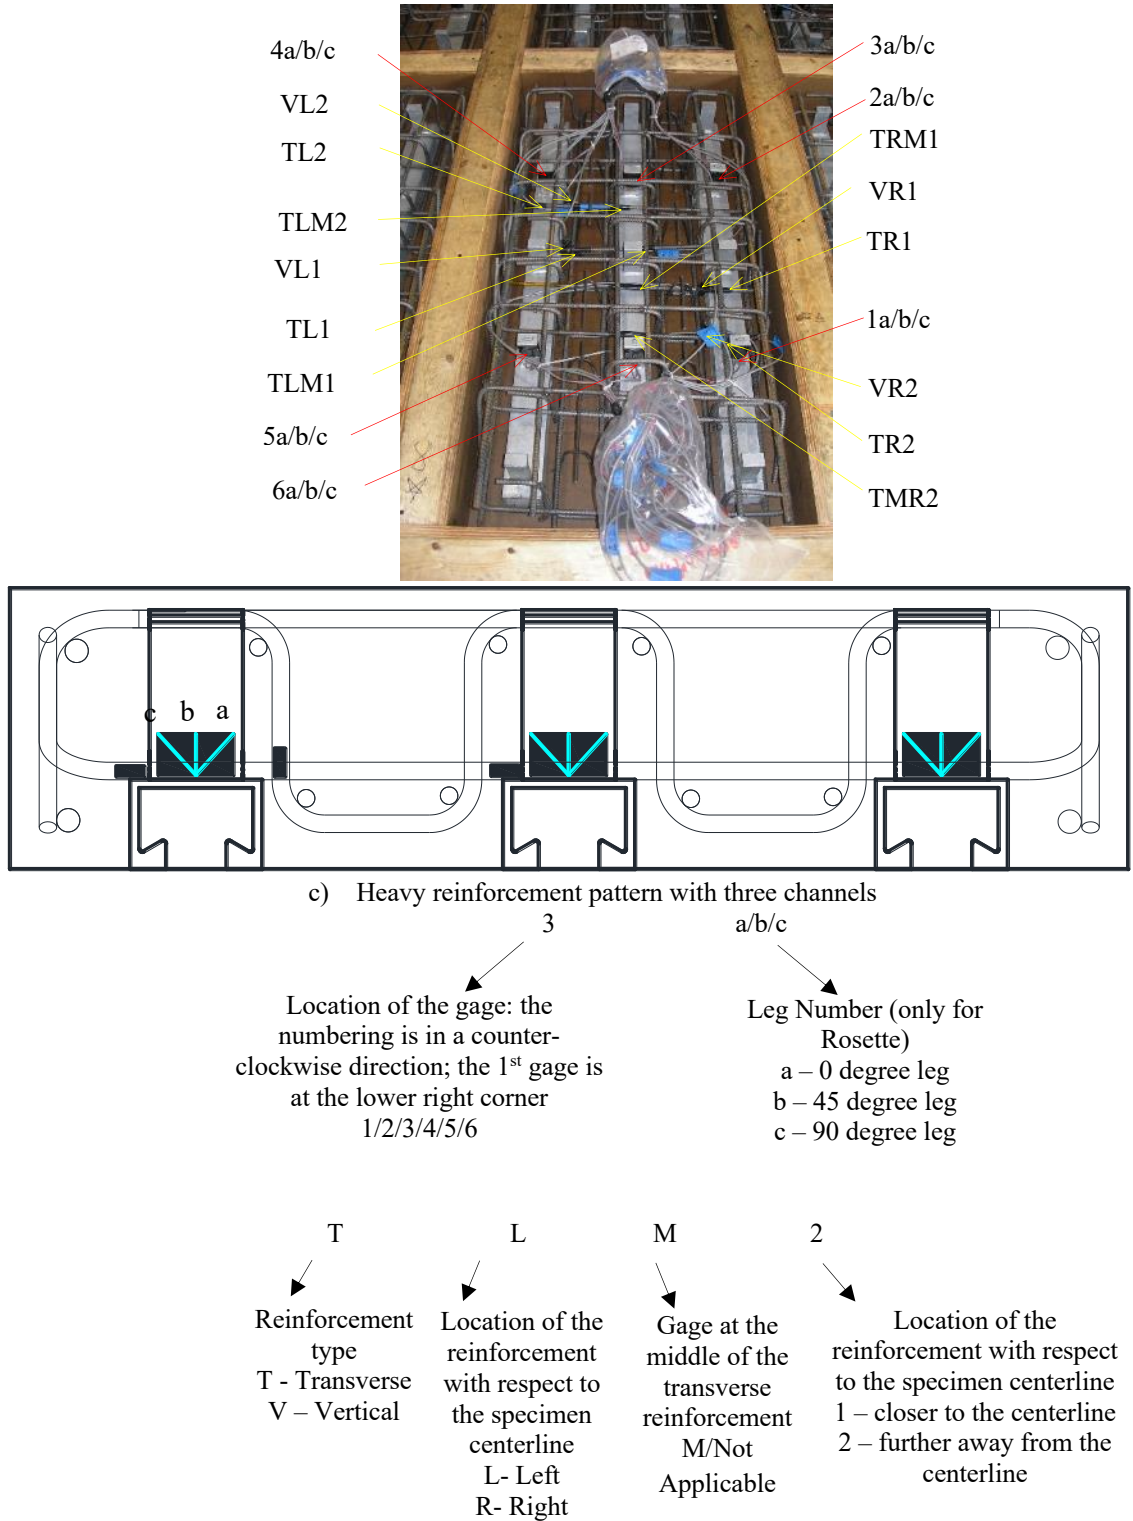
Strain gages attached on the reinforcement and channel anchors in pushout test specimens
